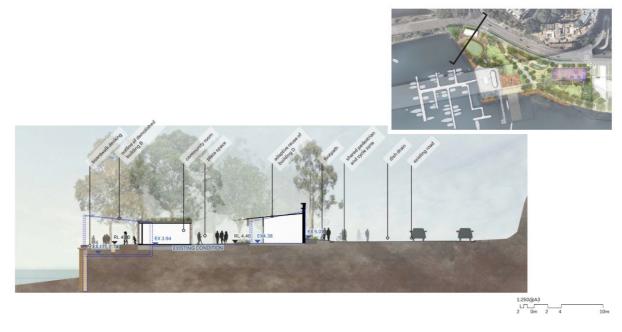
Section E (approximate north–south section) through northwest end of Bank Street Park, showing the proposed reduction of ground level at 1–3 Bank Street (with the adaptive reuse of Building D). (Source: Client provided)
